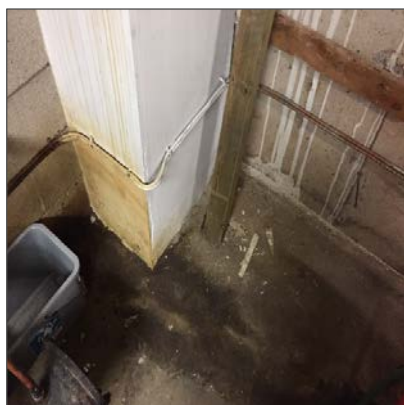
Damaged asbestos-containing drywall joint compound and debris, Basement Mechanical Room, West Wing.
